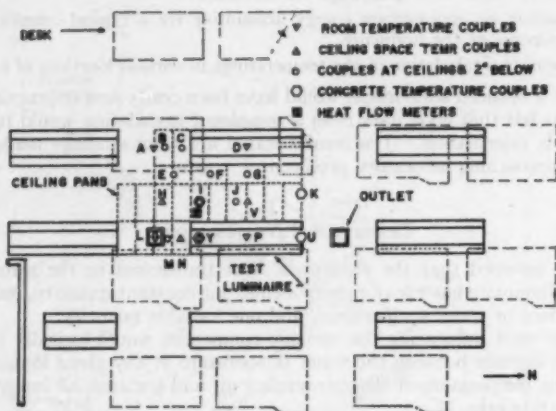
PART PLAN OF 9TH FLOOR SHOWING TEST AREA
